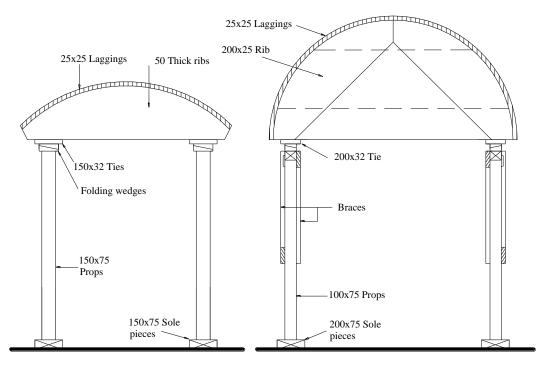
Center for small span arches Fig 2.9c Framed center for medium span arches (up to 1500mm)
